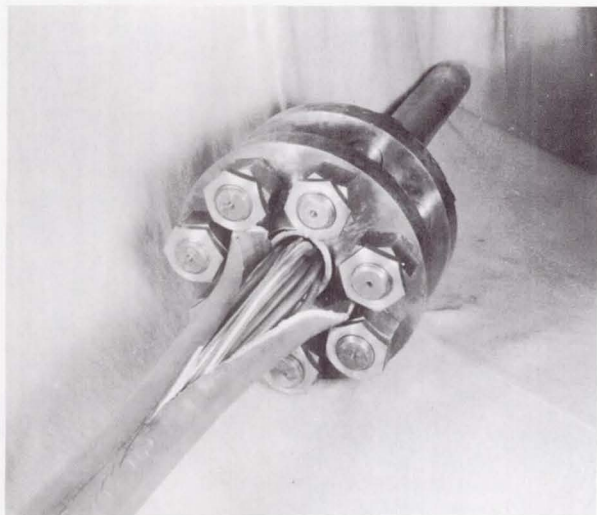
Failure of Duct-Flange Weld at 4600 psi Internal Pressure
